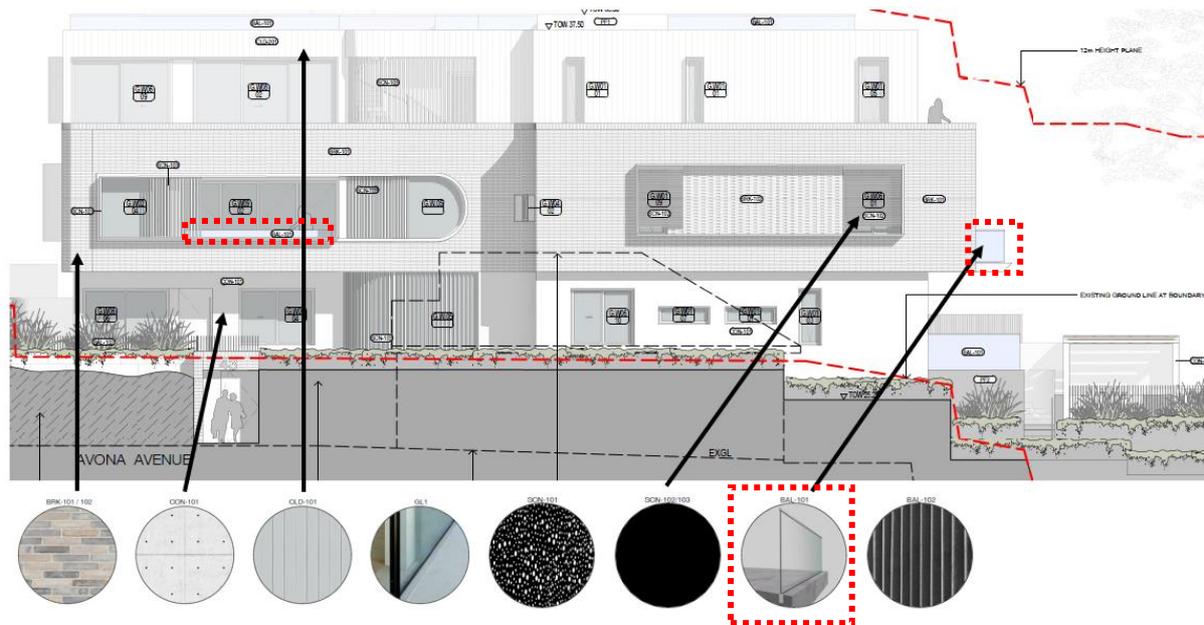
Proposed material schedule for the Avona Avenue elevation. Note; GL1 (glazing) and SCN-101 (perforated screen) are location on the north (side) and west (rear) elevations. Glass balustrades to be replaced are highlighted by red dashed lines.
